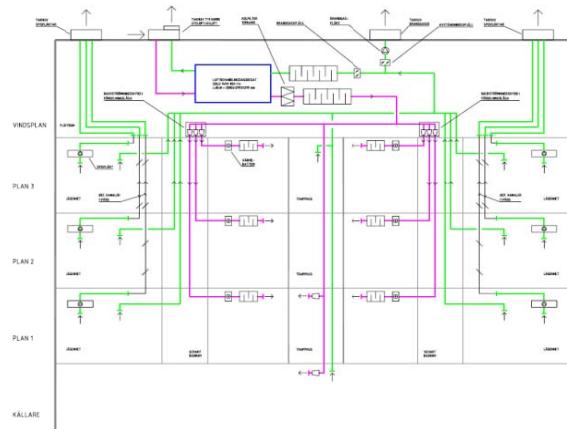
Designed ventilation system for the buildings with central ventilation, building E and F.
